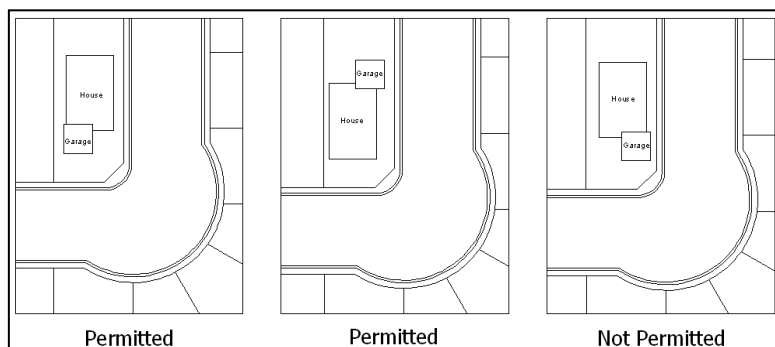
CORNER LOT PERMITTED GARAGE PLACEMENT
